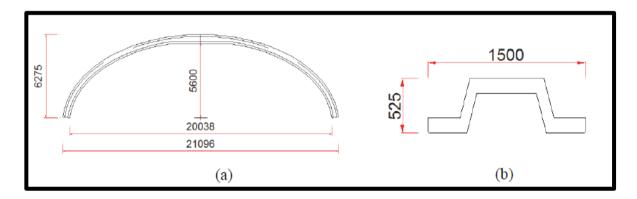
Proposed Arch Geometry (a) Parabolic Arch Profile (b) Corrugated Section (Tan et al, 2013)
